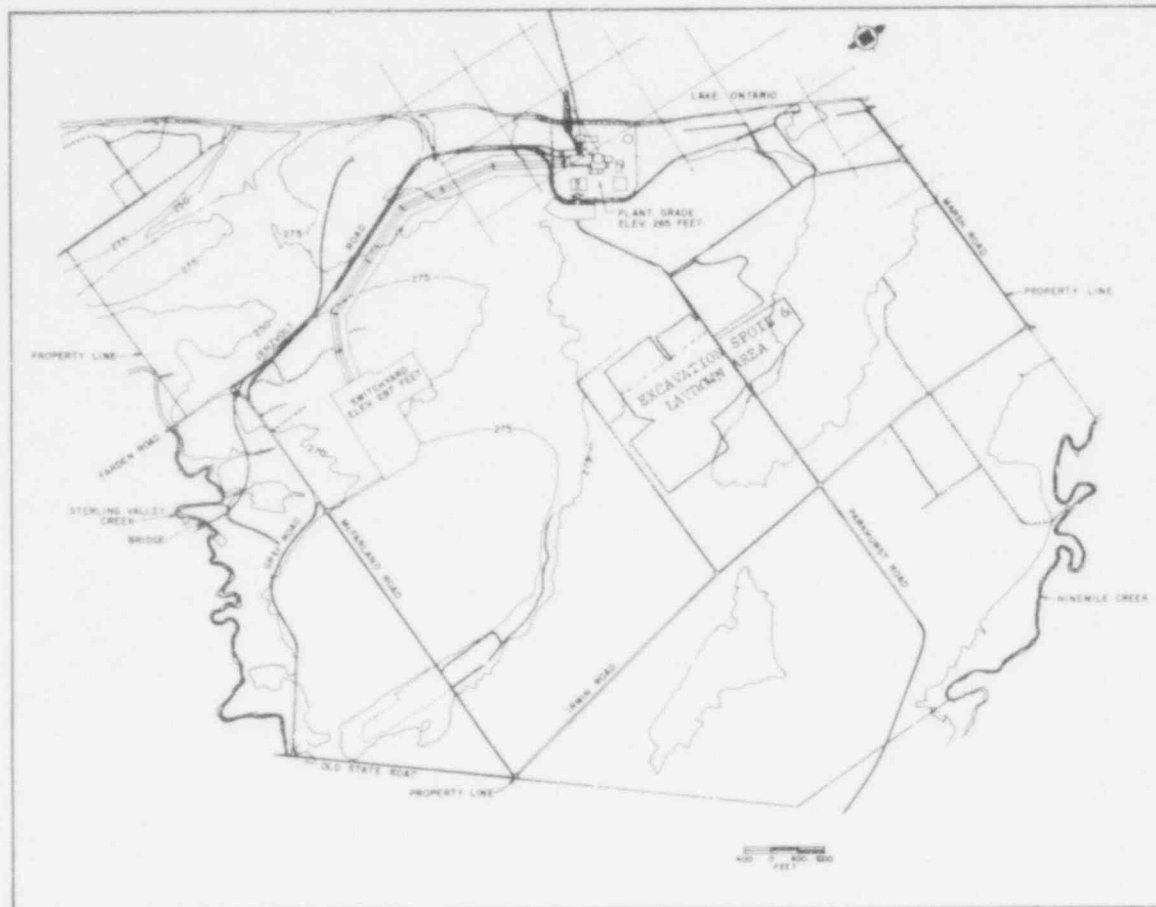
Site layout - Sterling Power Project Unit 1. Source: ER, Fig. 2.5-1, Rev. 2.
